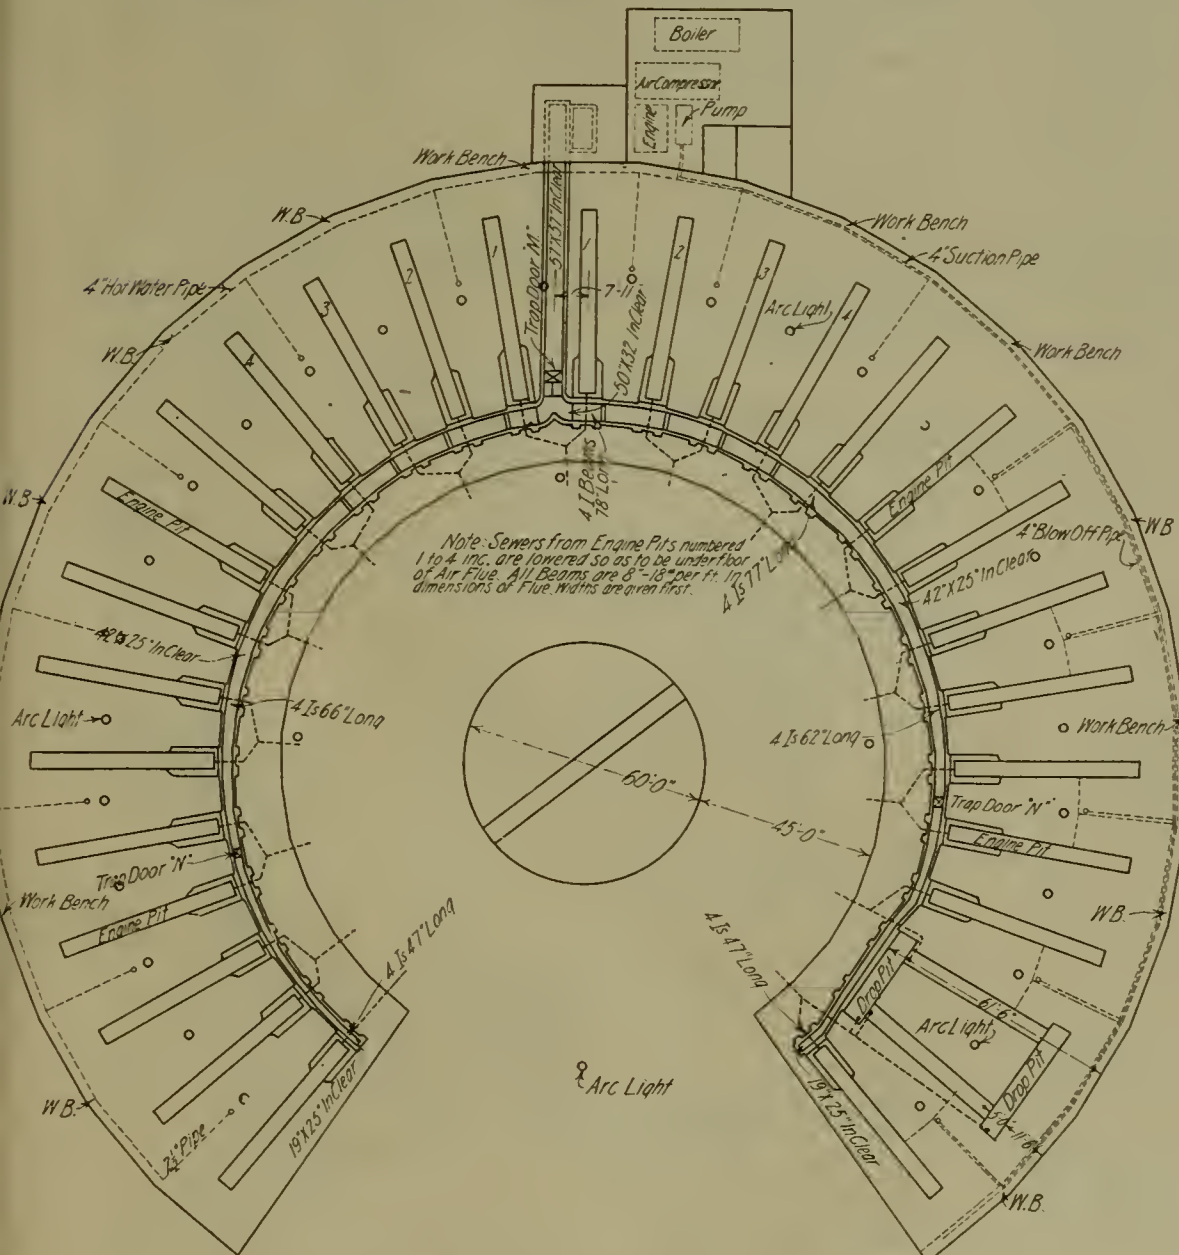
PLAN SHOWING AIR FLUE SYSTEM OF PIPING, MCKEE'S ROCKS ROUNDHOUSE, P. & L. E. R. R.
